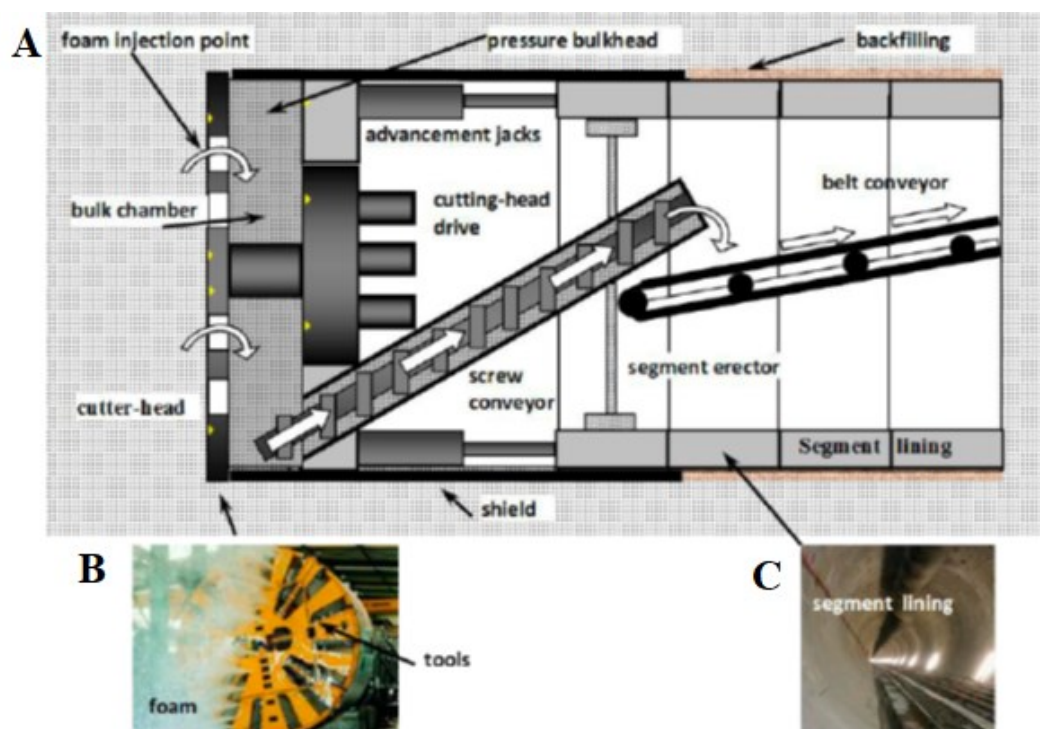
Schematic drawing of EPB shield machine elements: A) Transversal section with main components. B) Cutting tools and Foam injection point on the Cutterhead. C) Installed segment lining. (modified from Peila et al., 2009).
